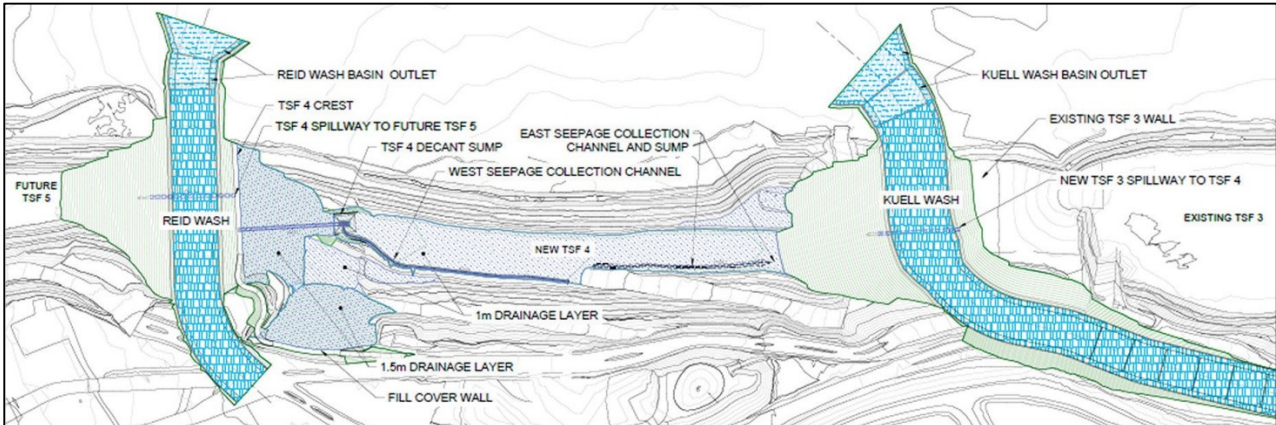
Tailings Storage Facility 4 layout prior to deposition.
